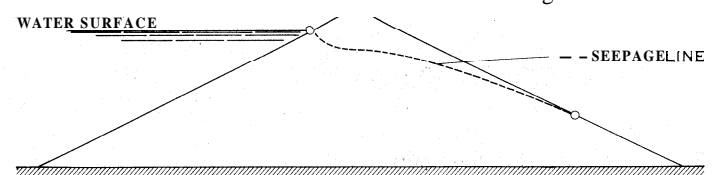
HOMOGENEOUS DAM WITH AN IMPERMEABLE FOUNDATION
